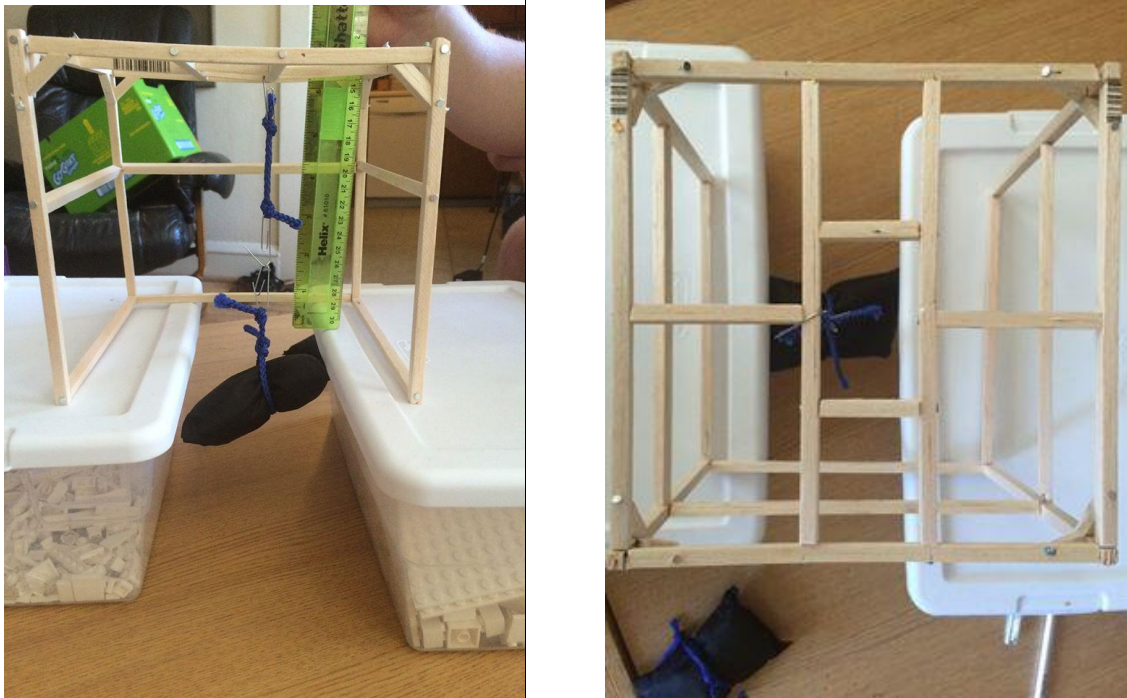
(Left) 6 members truss system being loaded with a 1 lb. (4.45 N) at overhead beam bisection and (right) overhead view of 6 member truss loading case.
